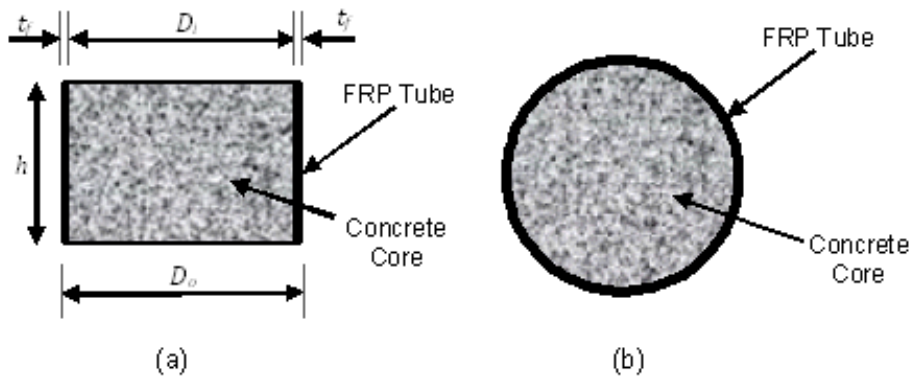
Schematic showing specimen details: (a) Cross-sectional elevation, (b) Cross-section view
